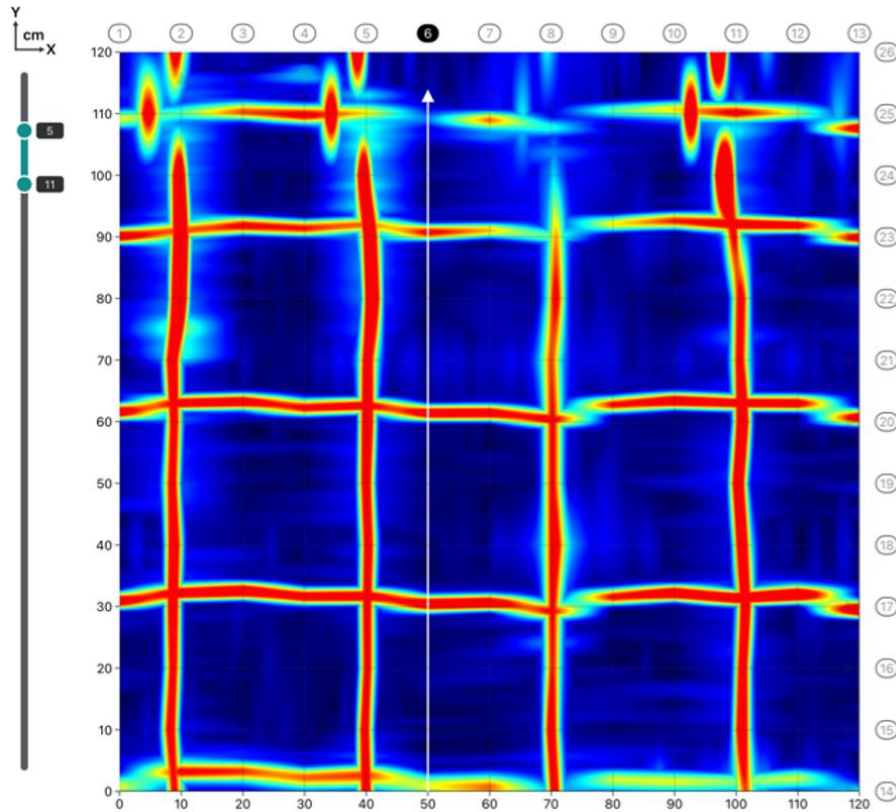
Sample of GPR elevation scan results for a cross wall in Langton House
